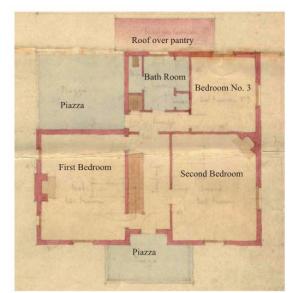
Original Upper floor level, 1929 Source: Woollahra Council
